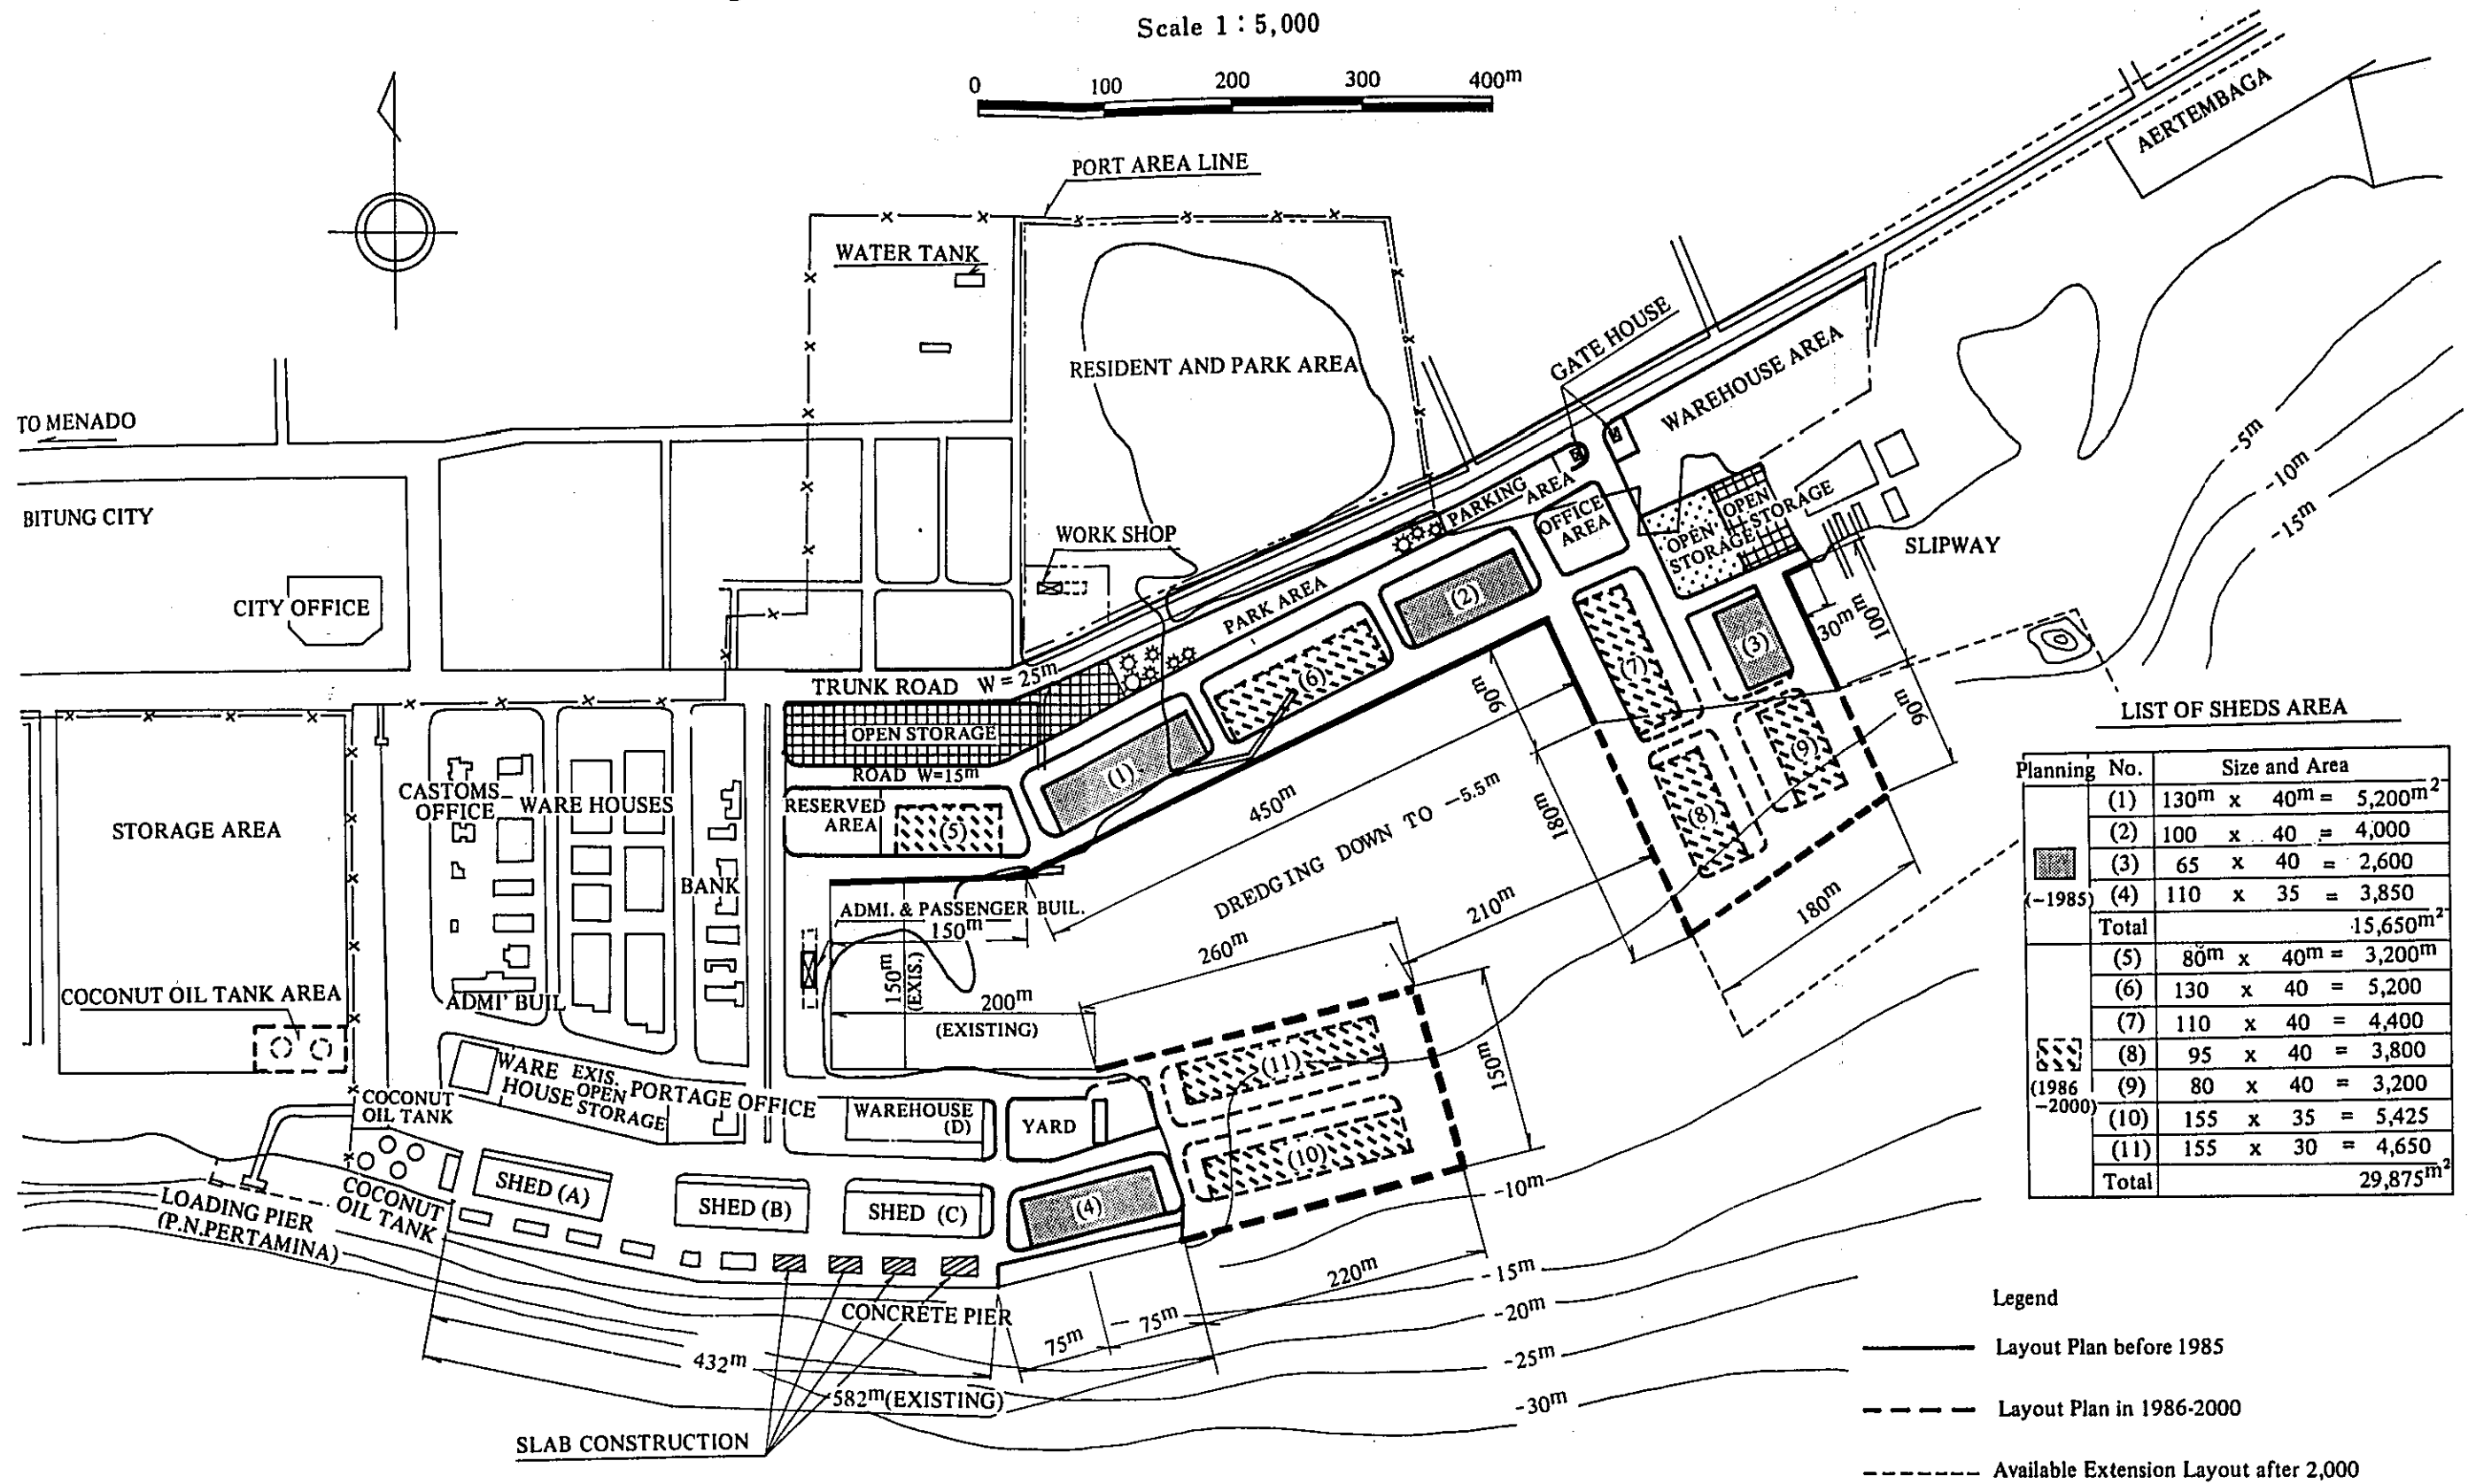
Alternative-2. Layout of Port Terminal Facilities
